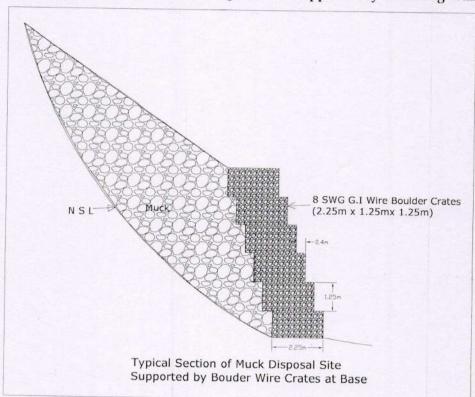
Typical Section of Muck Disposal Site Supported by Boulder Wire Crates at Base
